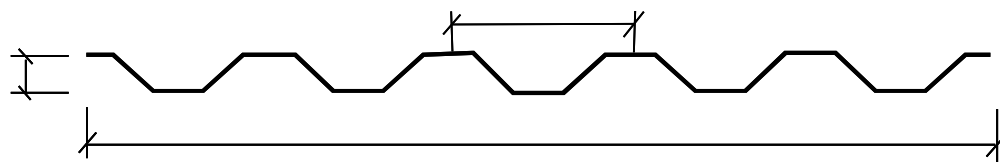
Metal Deck Profile for Wall and Roof Systems.
